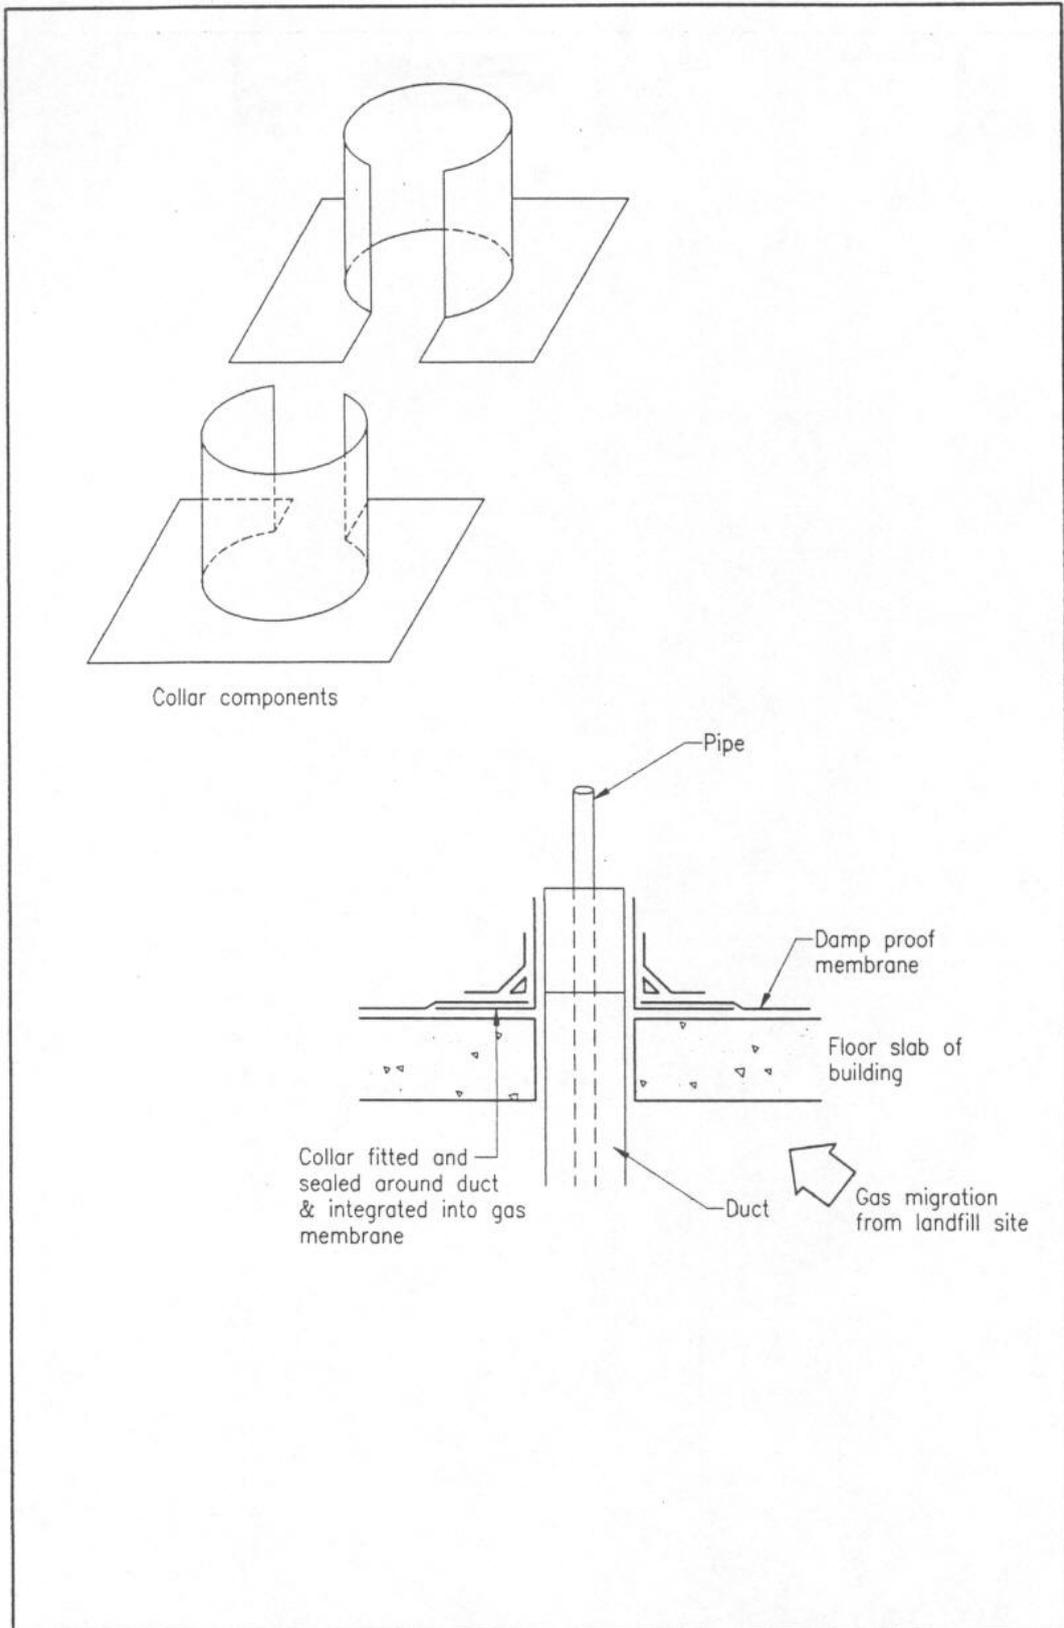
TYPICAL DETAIL OF COLLAR SEAL (CROSS-SECTION)
